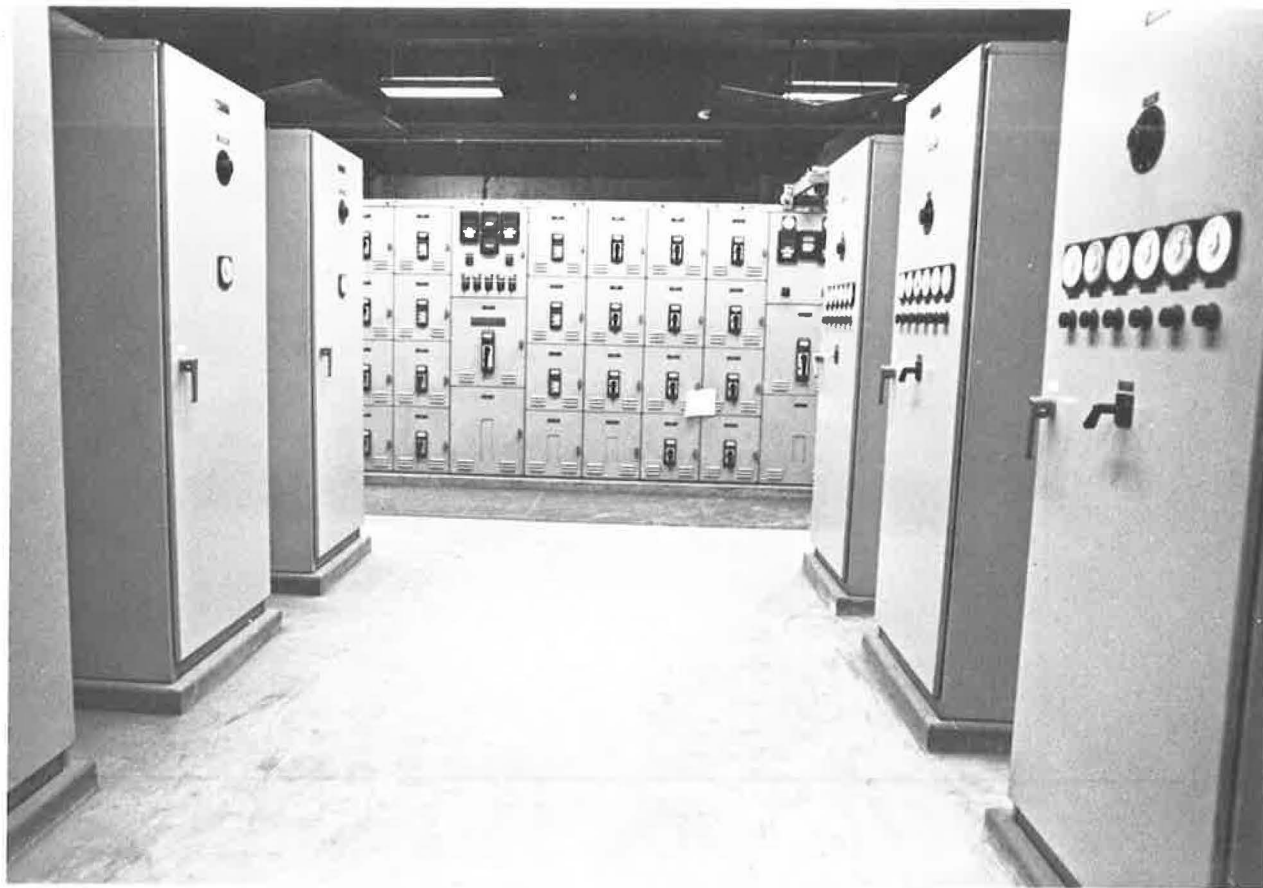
Electrical switchgear for lighting and ventilation (Fort Pitt Tunnel).
